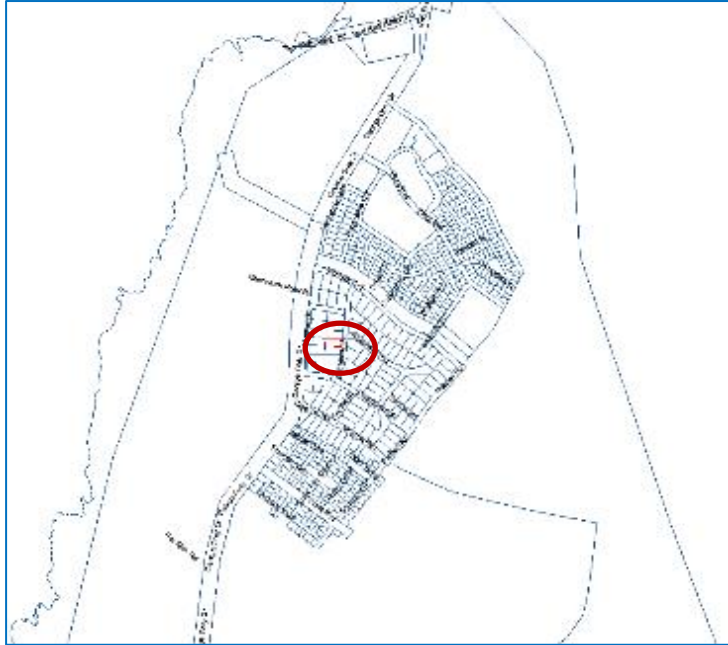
Locality plan of Lot 36 (No.123) Castaway Street, Kalbarri
